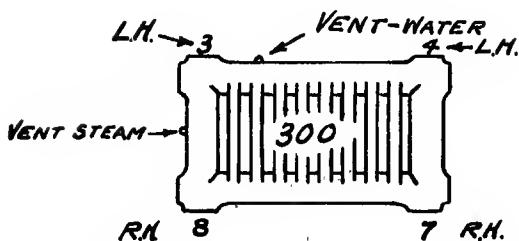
Assembled in two or more stacks. One and two pipe steam only. Bottom feed only.
